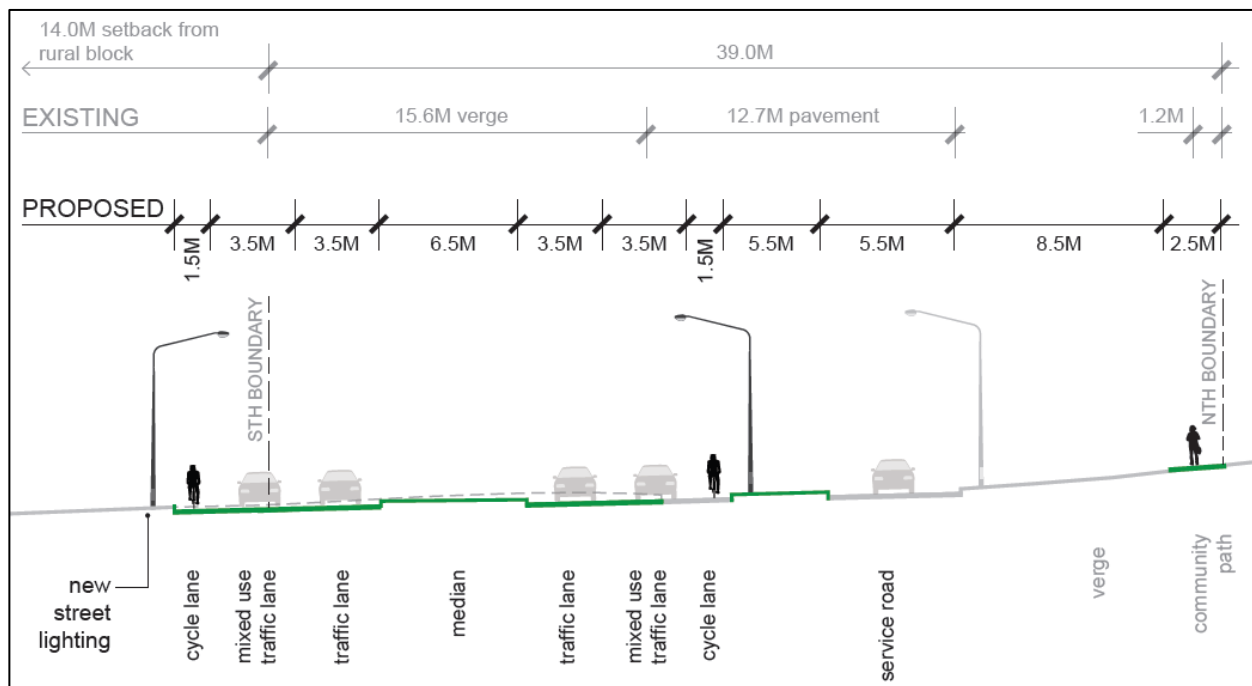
Potential First stage cross-section for Drake Brockman Drive between Spofforth Street and Macnaughton Street
